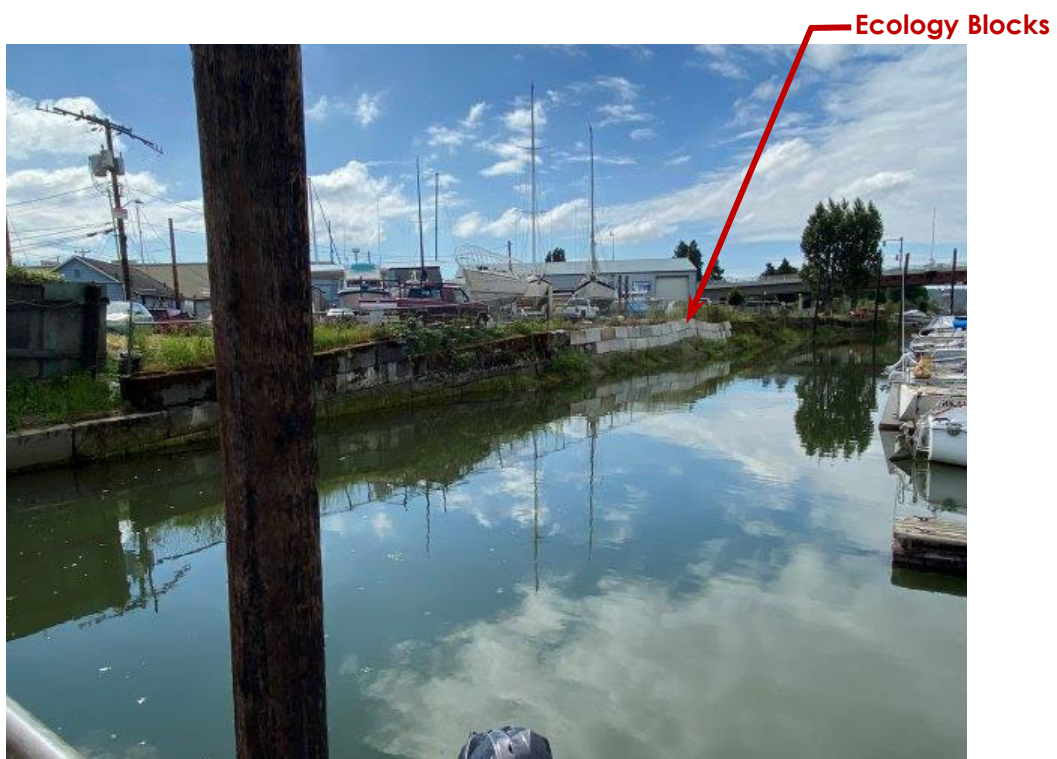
Retaining Wall Bulkhead (Looking North)
